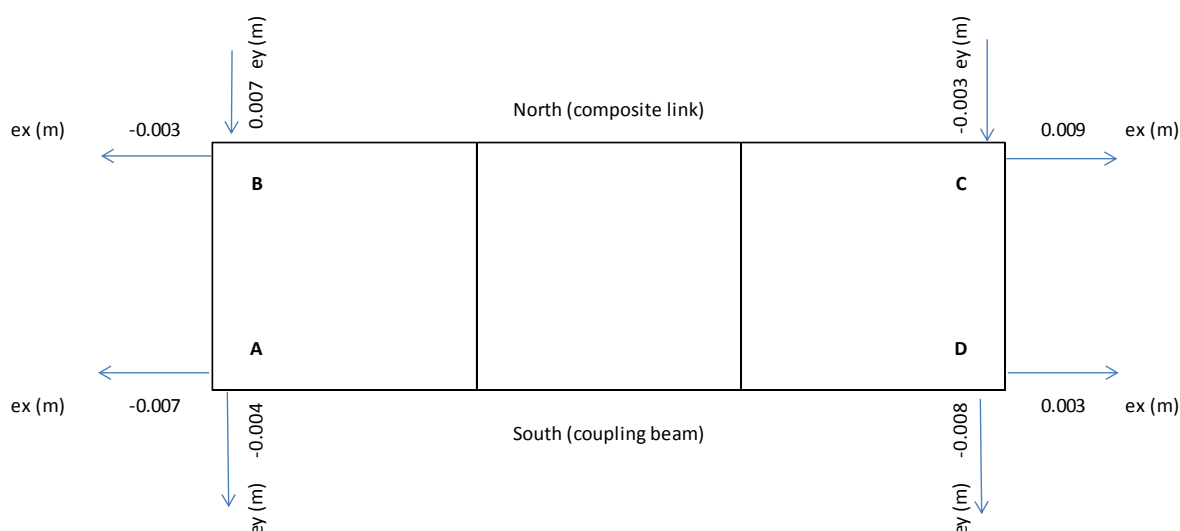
Out of plumb, 3rd measurement, 3rd floor
